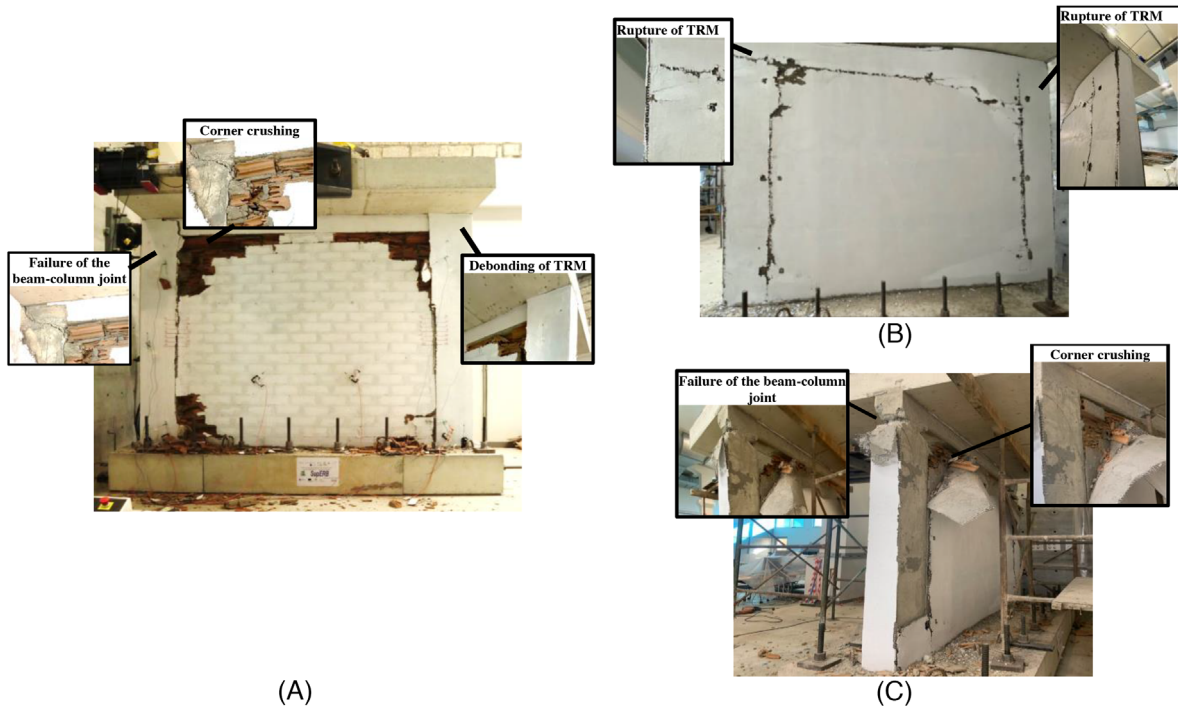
Cracking pattern and the failures occurred on M-P specimen (A) at the unretrofitted side, (B) at the retrofitted side, and (C) after removing the TRM retrofitting layer.
